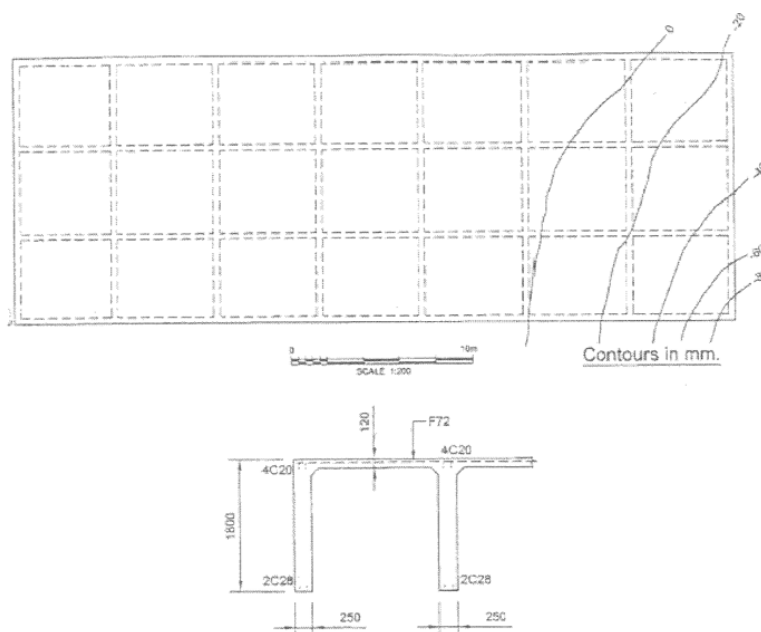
Footing layout showing distortion pattern and details for a well designed raft
